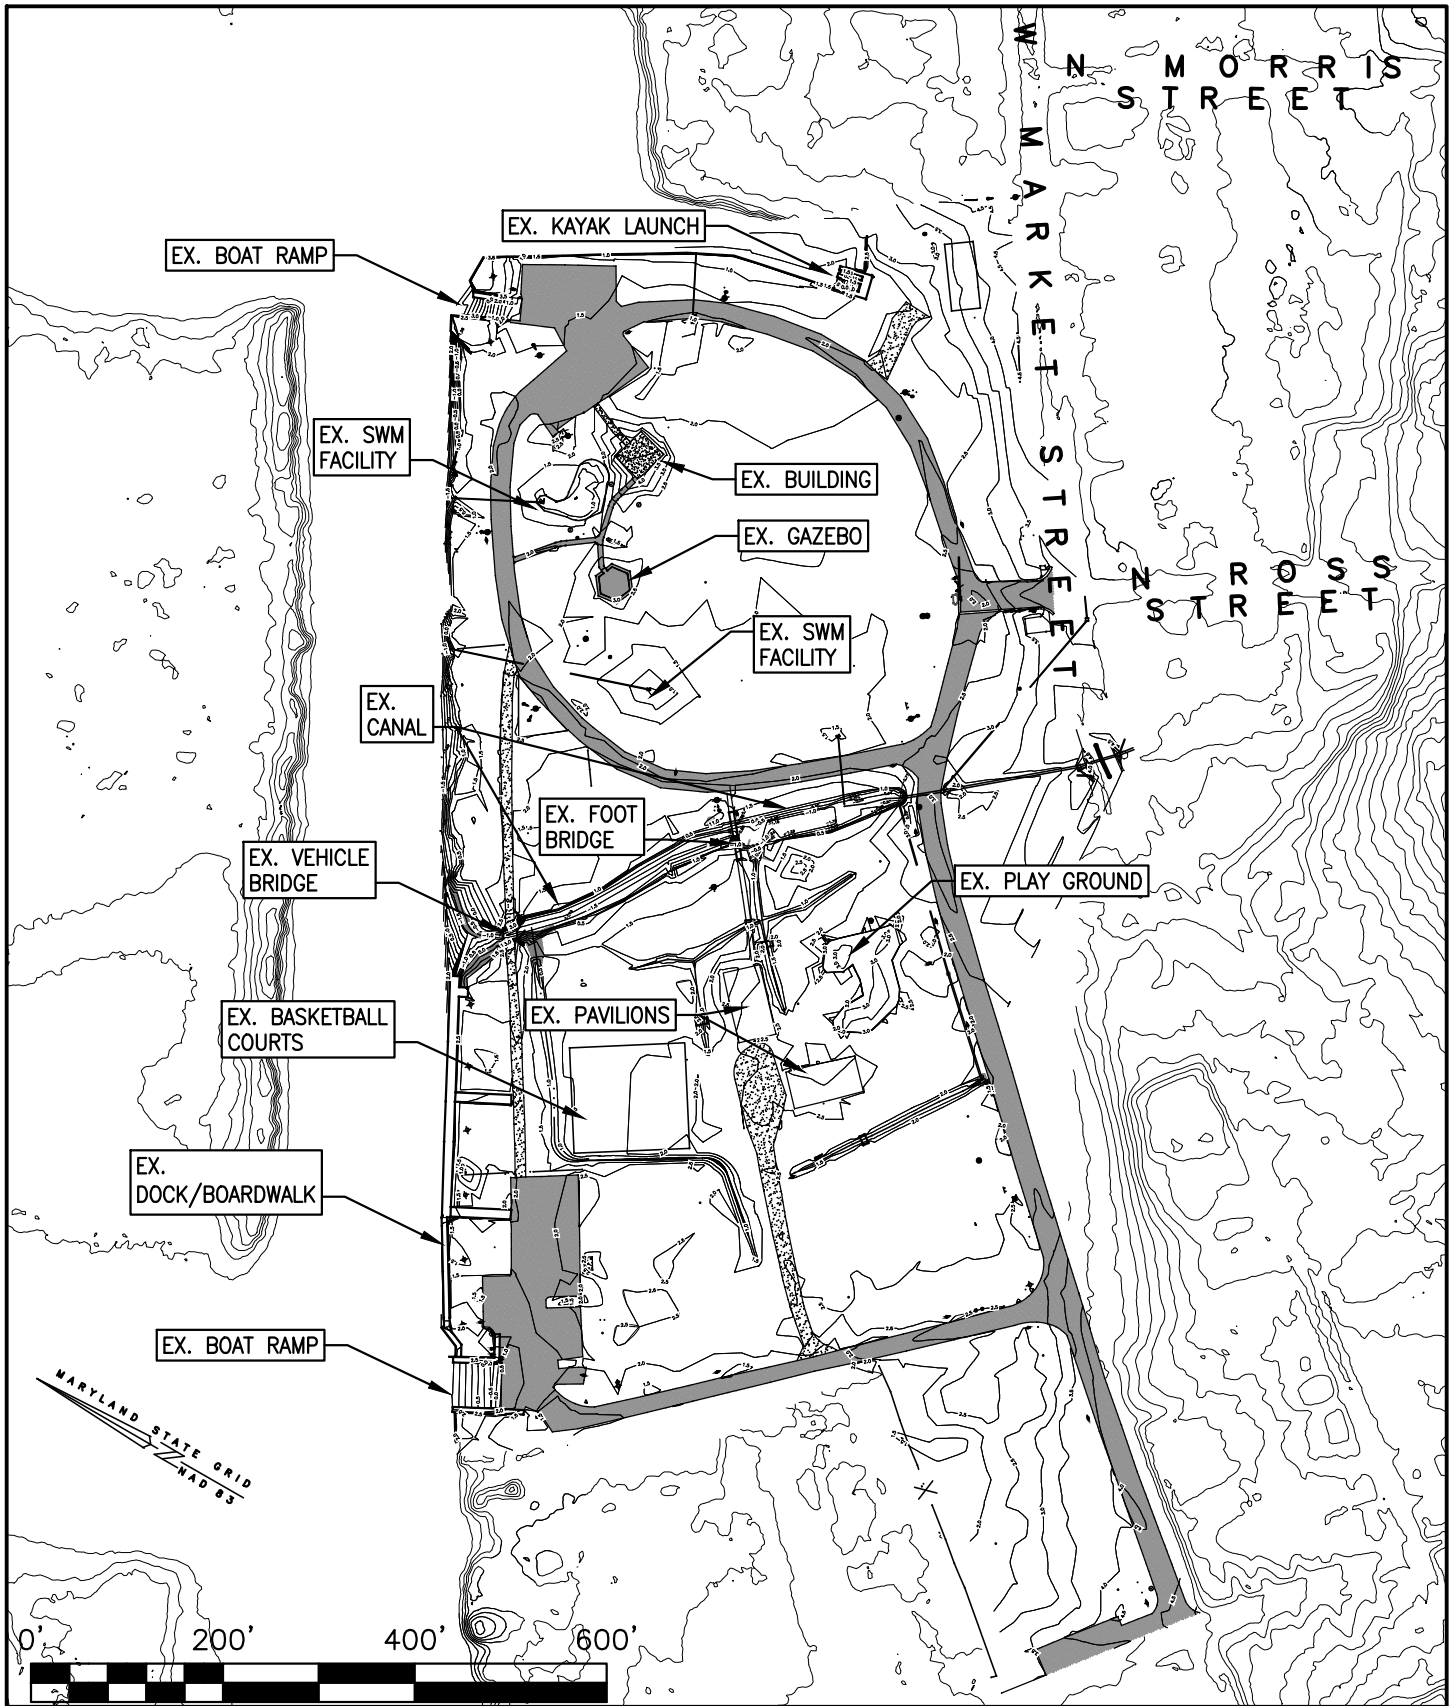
DRAINAGE AREA MAP BYRD PARK FLOODING, STORMWATER, AND SUBSIDENCE ASSESSMENT
